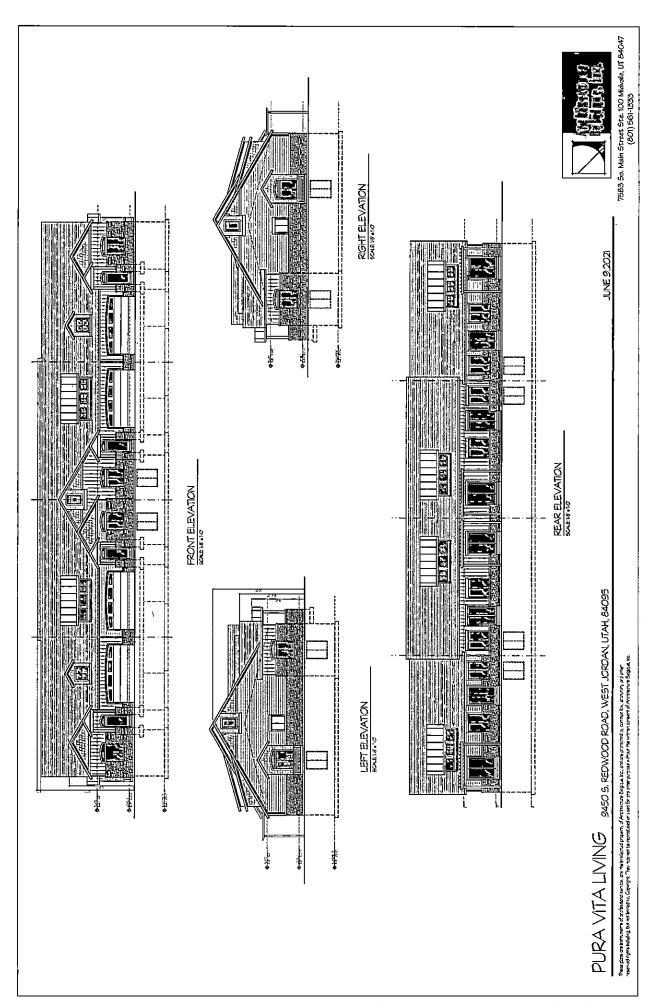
EXHIBIT H - RESIDENTIAL FLOOR PLANS
